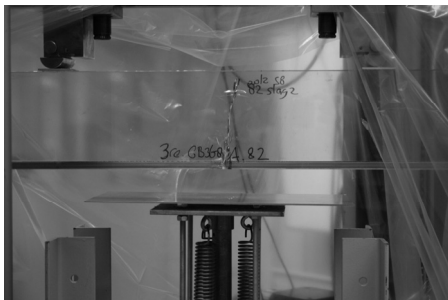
Typical model level II damage in 3re.GB368.A specimen.
